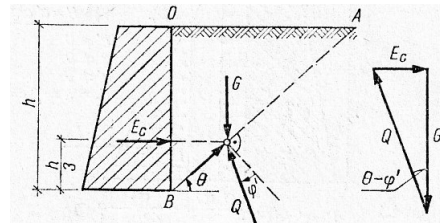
Assumptions for the solution of Ch. Coulomb, concerning the determination of soil pressure on a retaining wall (in the present case the retaining wall is a bridge abutment) [3]. Marking: BA - slip line determined from the extreme pressure condition, OA - fragment wedge length, h - embankment height (height of bridge abutment).
